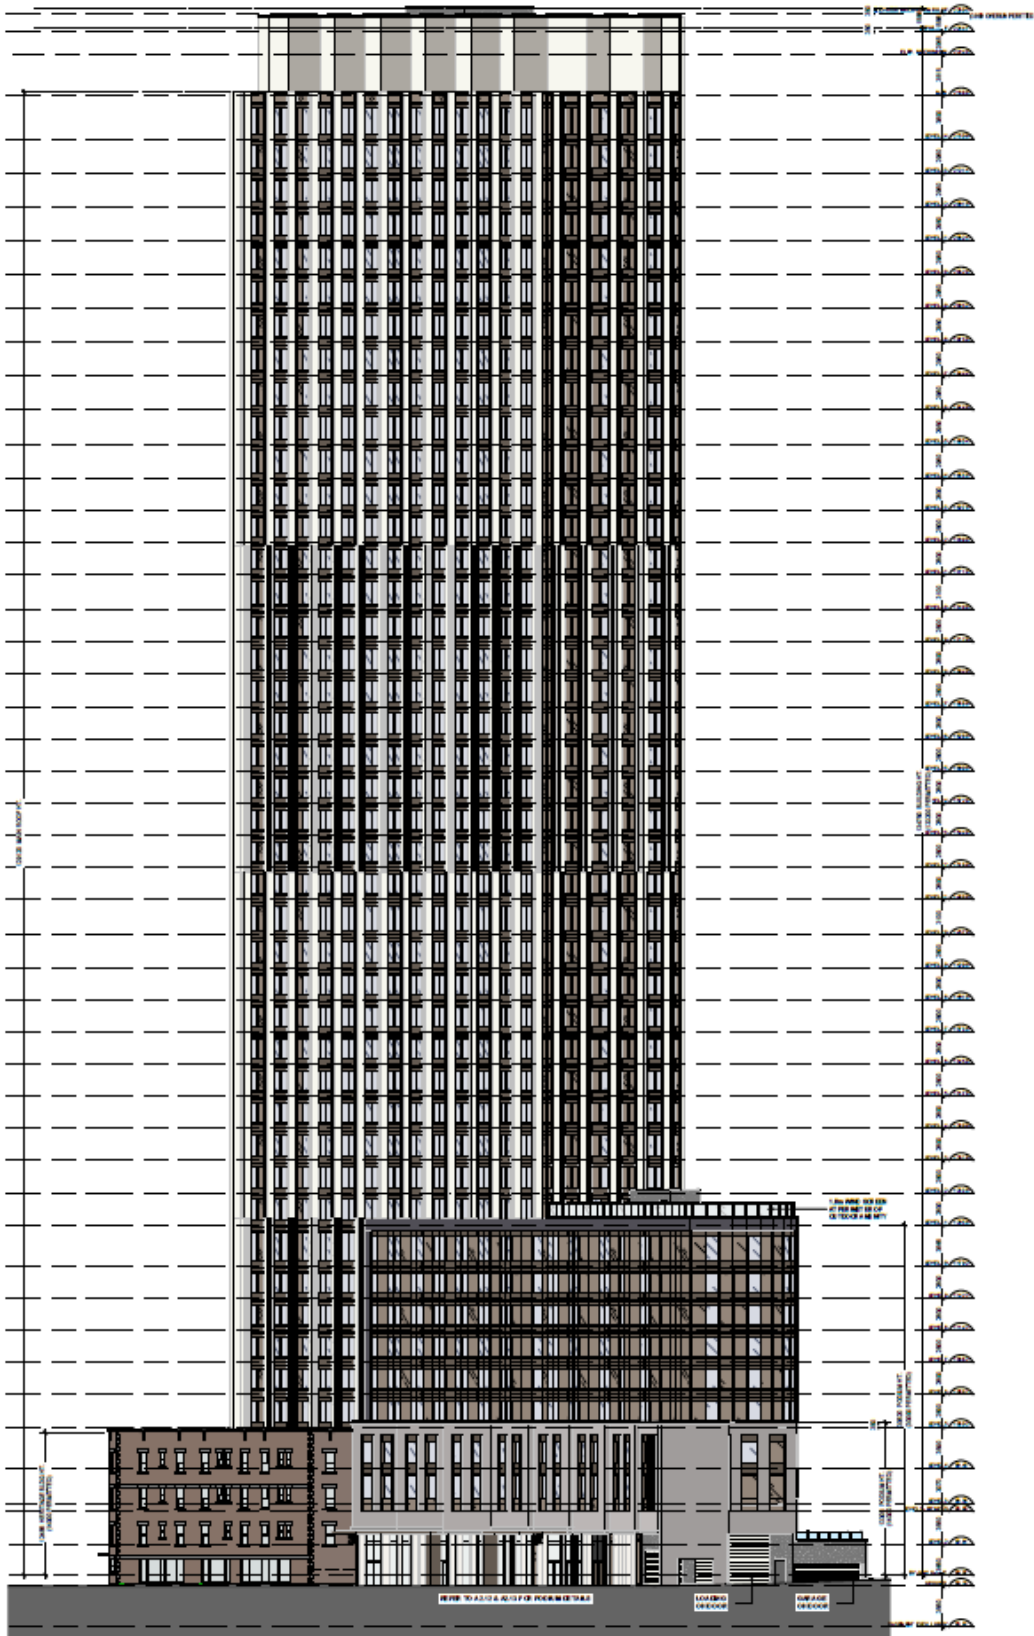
Proposed east elevation of 212 Dundas Street East included for illustration purposes (Rafael & Bigauskas Architects Inc., February 23, 2026).
